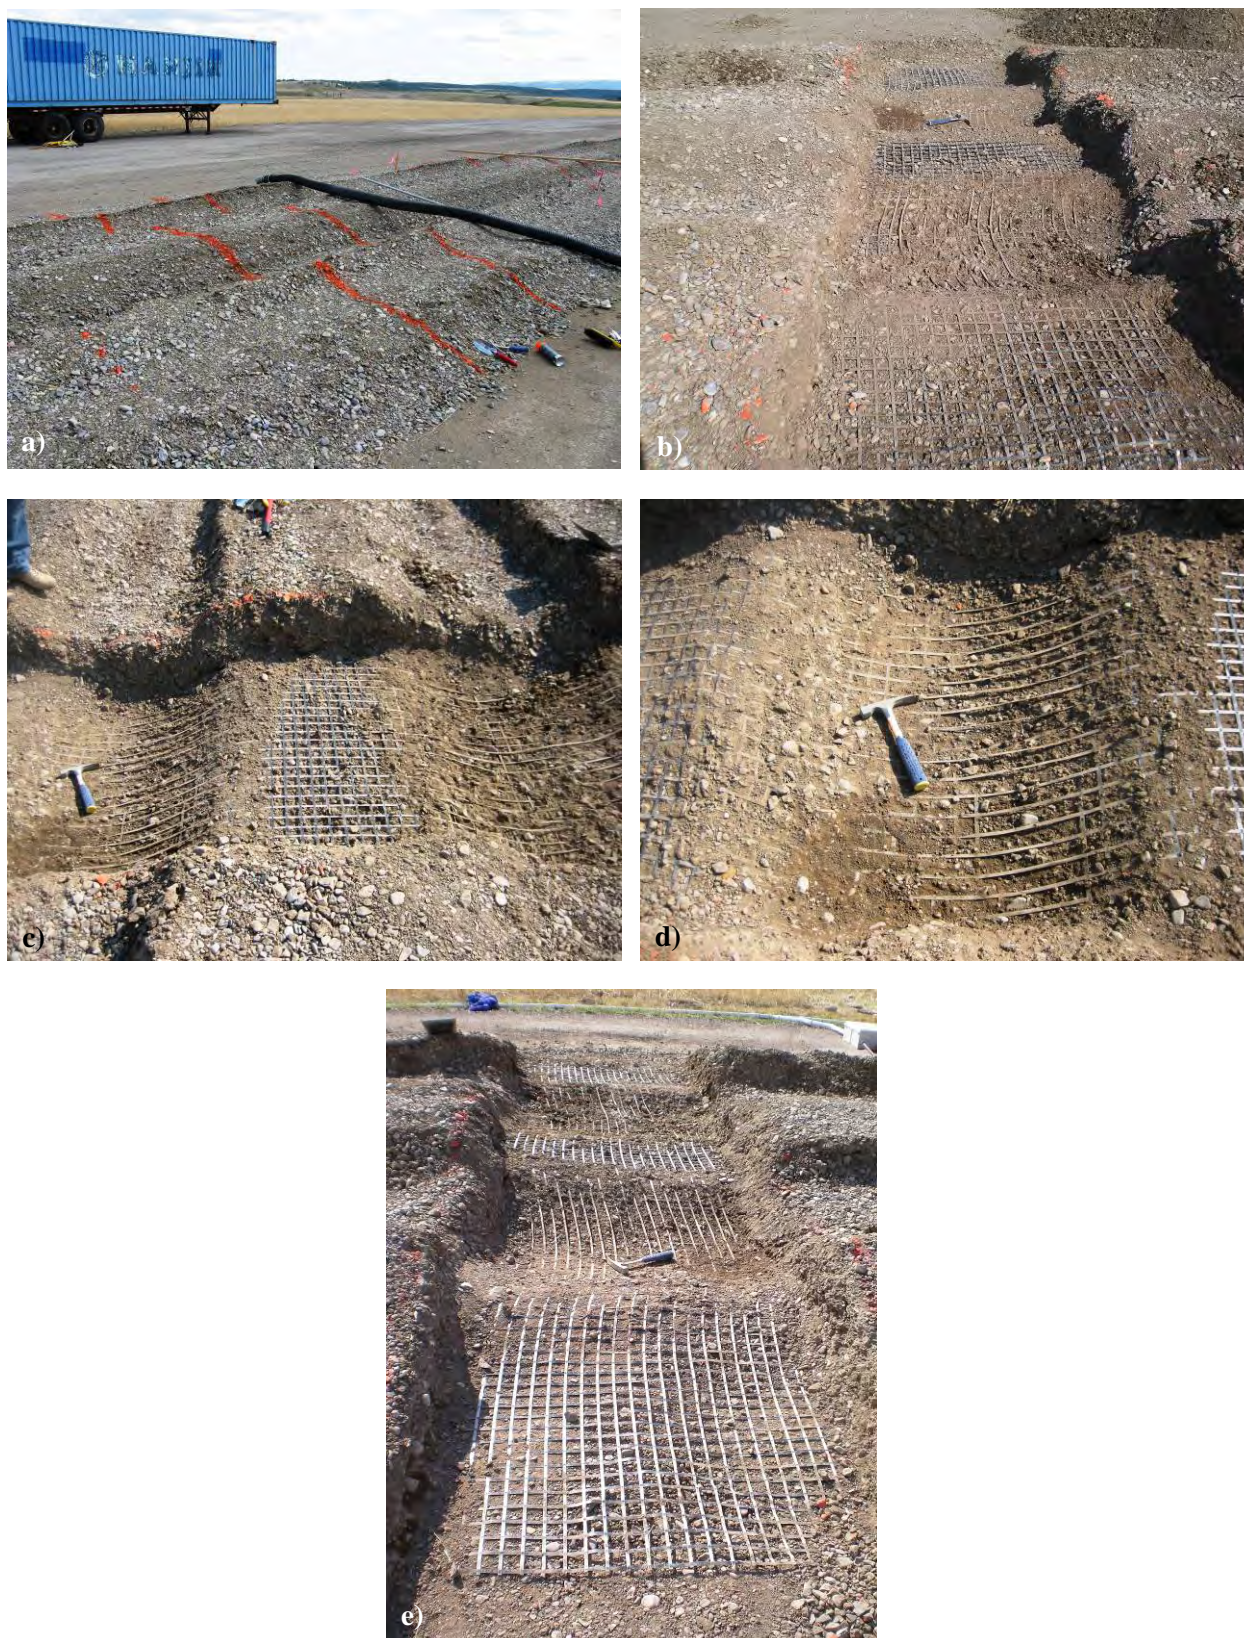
Photos of the forensic excavations of the WeG-1 test section: a) excavation area, b) looking east, c) rut profile, d) close-up of rut, and e) looking west.
